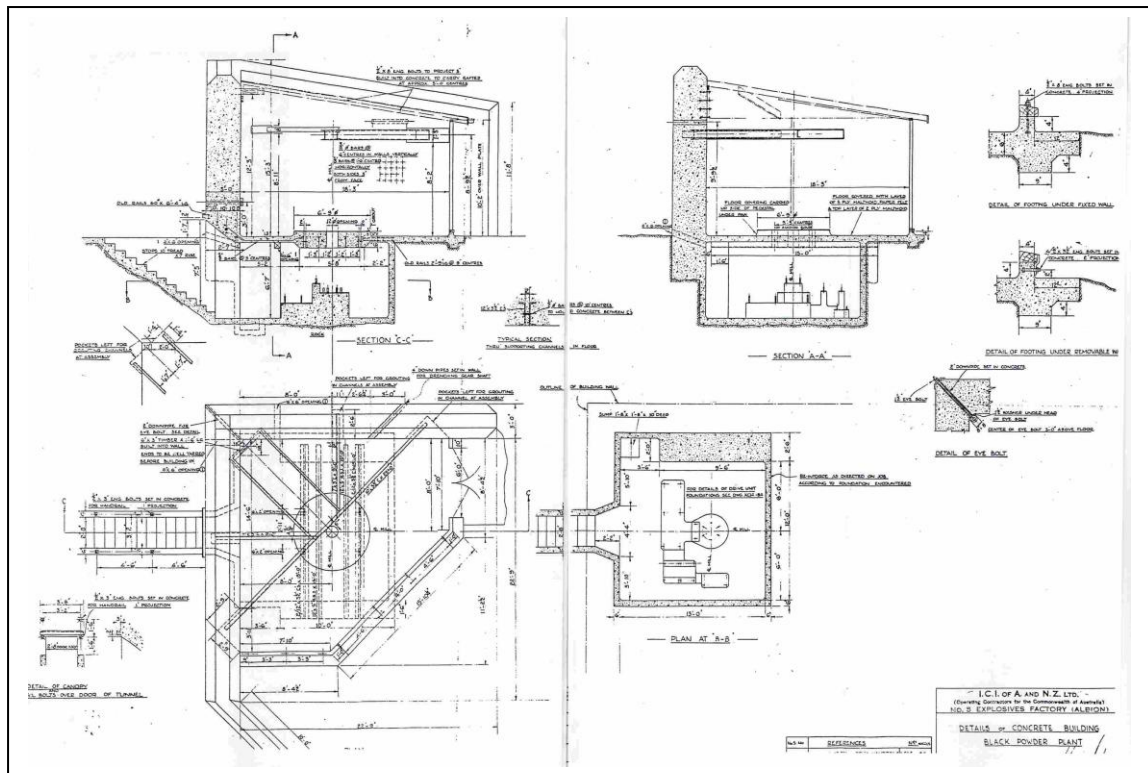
Details of Concrete Building, Black Powder Plant, Albion Explosives Factory, Drawing B/22131/P.
